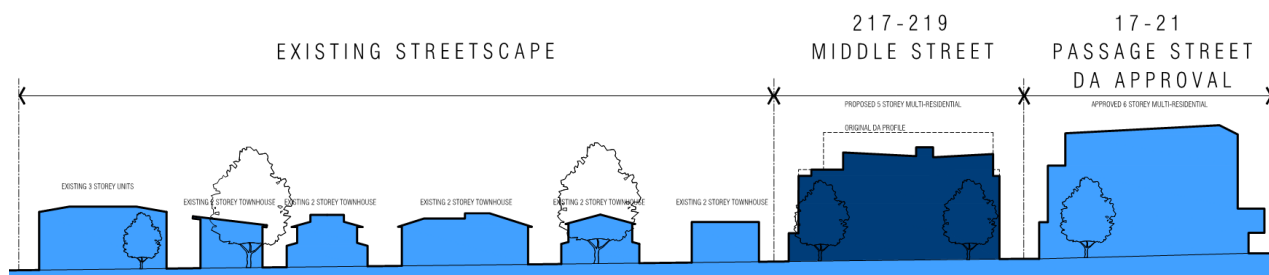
Streetscape section showing the proposed development alongside existing and approved development
